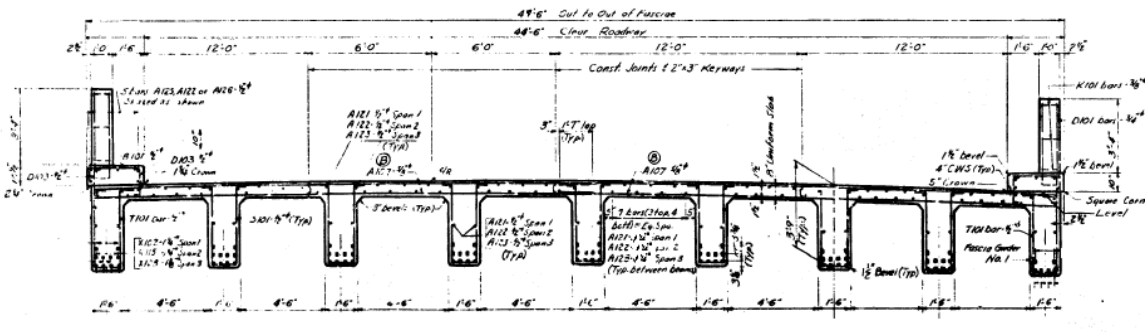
Cross Section of Reinforced Concrete T-Beam Bridge
